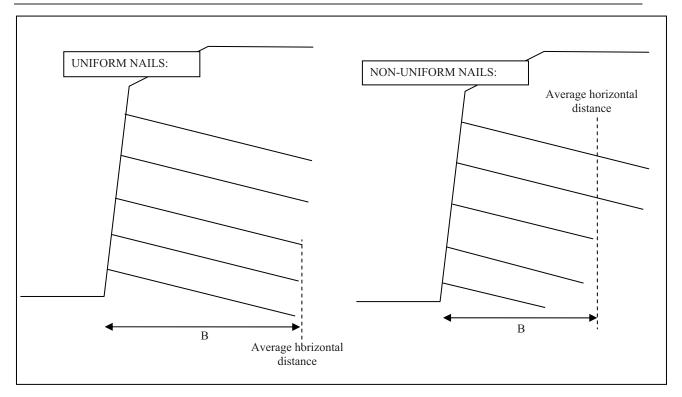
Schematic. Wall base length, B, used for external stability calculations.
